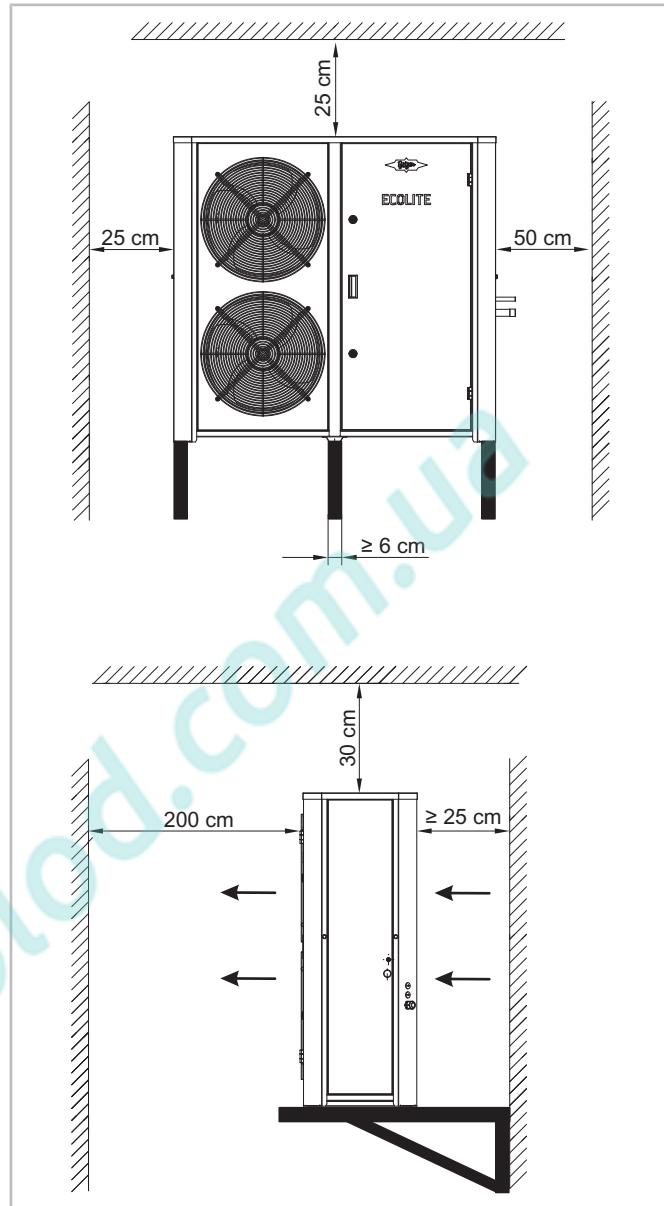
Minimum distances to the wall and ceiling when mounted on a mounting bracket (example shows LHL5E/ ..)
